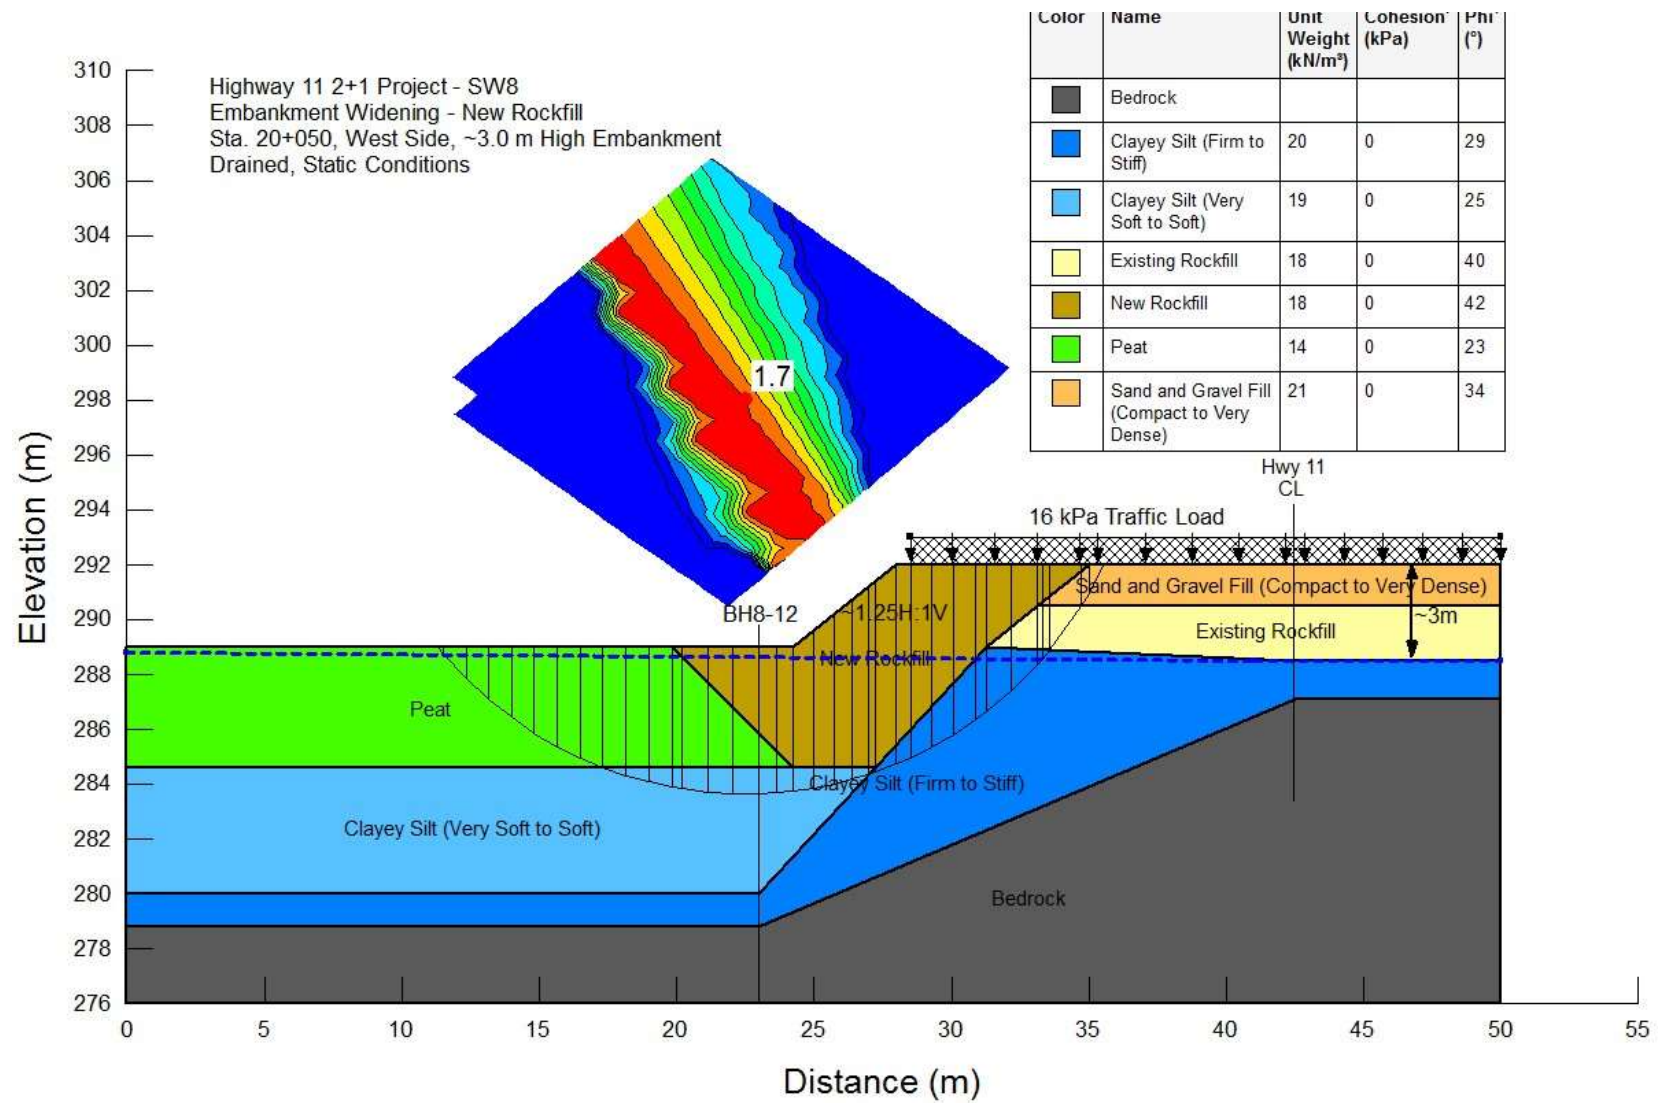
Slope stability analysis for embankment widening at Sta. 20+050, west side (~3 m high) – Rockfill (1.25H:1V) – drained, static condition
